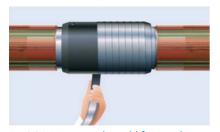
Wrapping the weld fitting with aluminium adhesive tape
